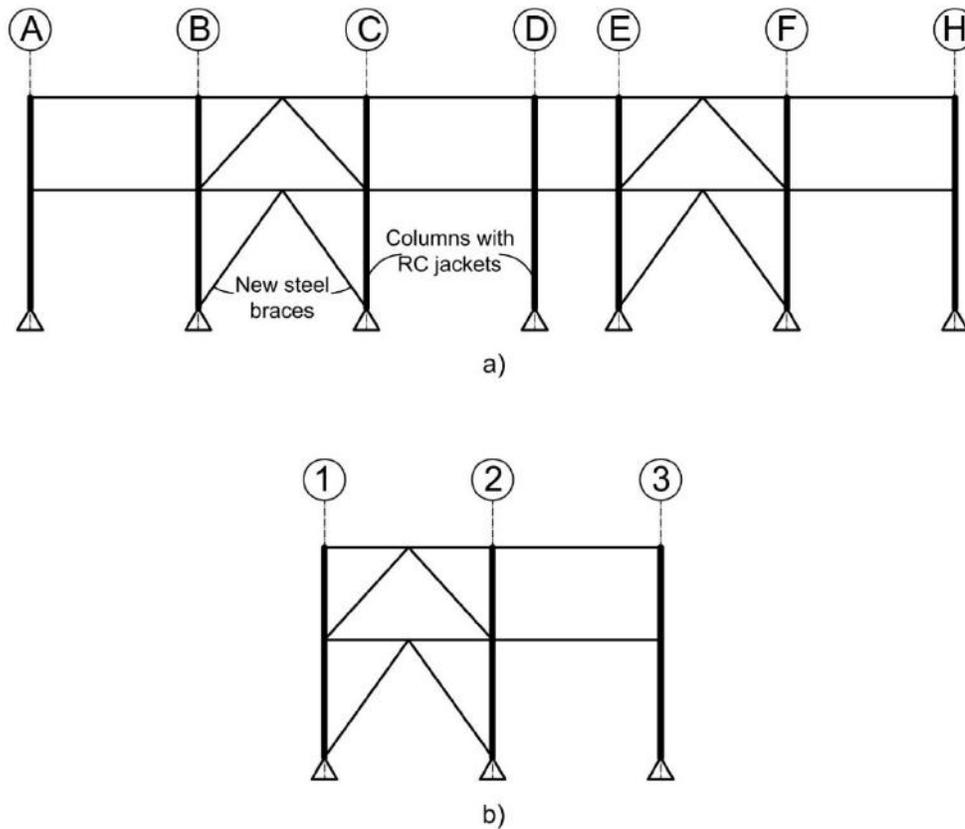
A 2-D numerical model of the retrofitted building (RS2): a) Frame 1 and b) Frame B.
